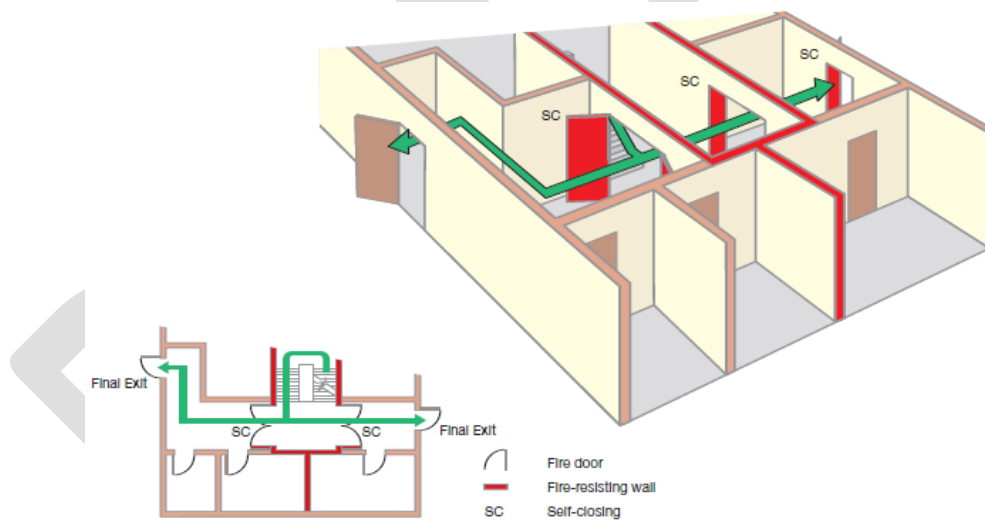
Example of 2 alternative escape routes from a protected stairway to final exits
